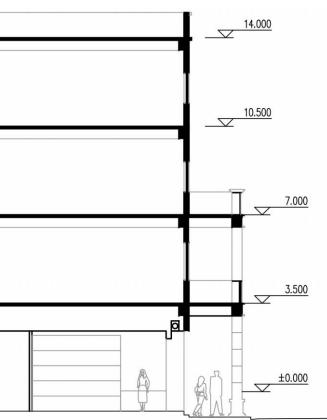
Section b11-b11 1:150 (Source: Drawn by the Author)
